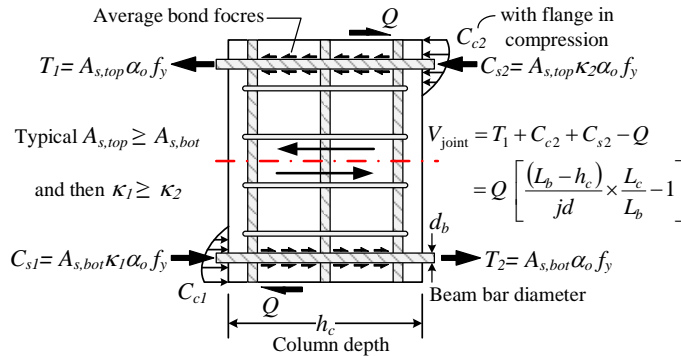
Horizontal shear and bond forces acting on the joint concrete.
